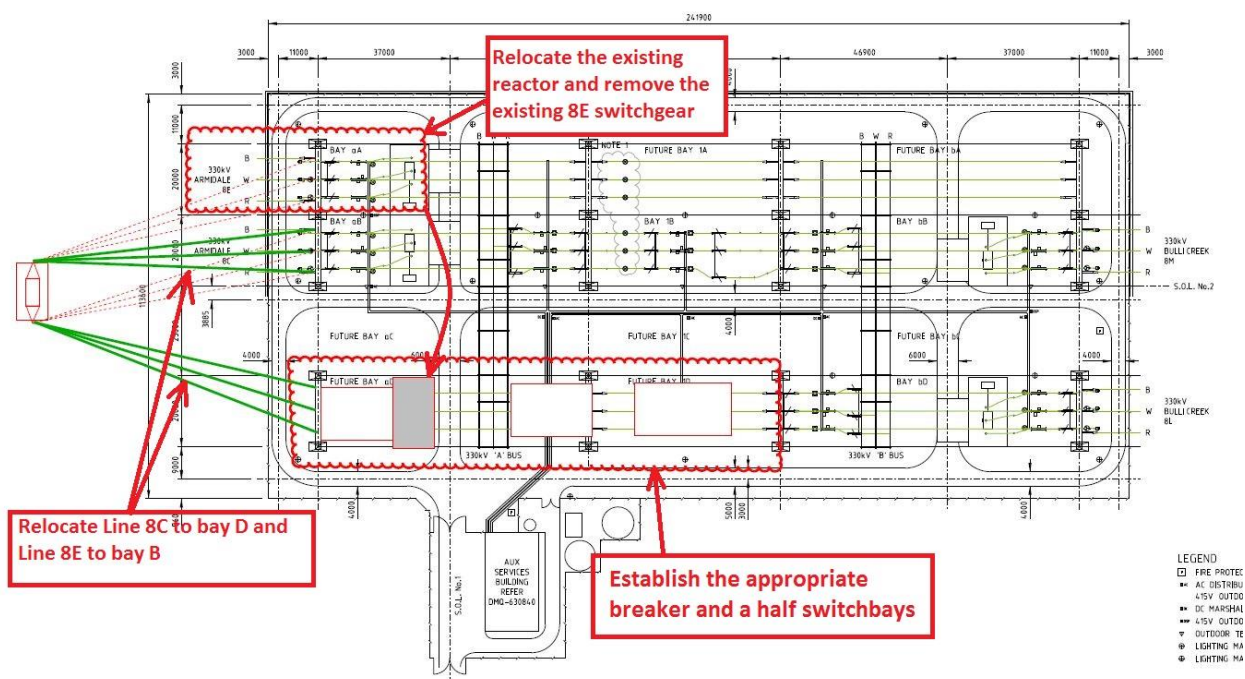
Proposed Rearrangement to Breaker and a Half at Dumaresq
